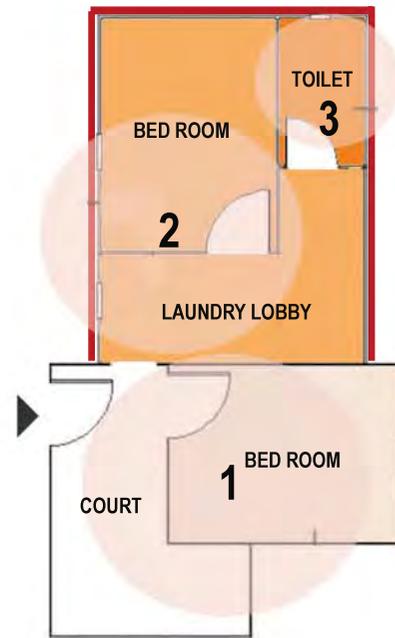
,1 PHASES OF THE HOUSE BUILDING DEVELOPMENT
